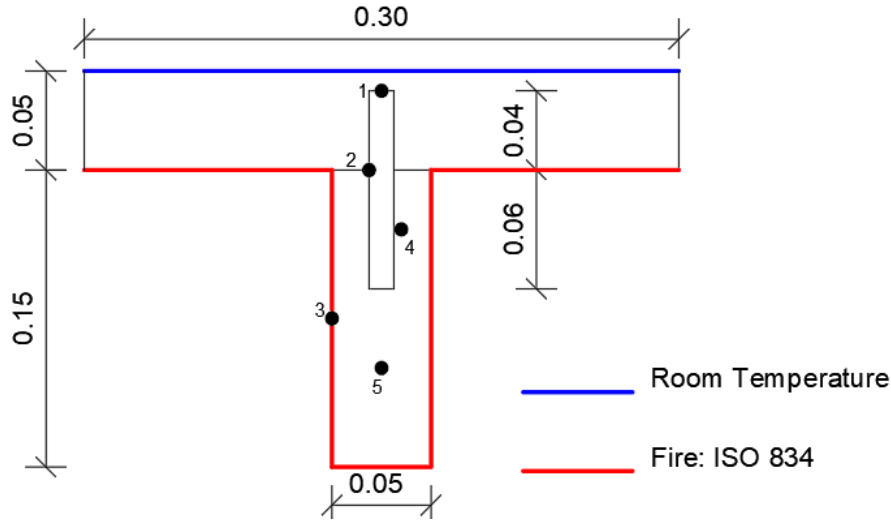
Cross-section of the timber-concrete composite element (dimensions in meter)
